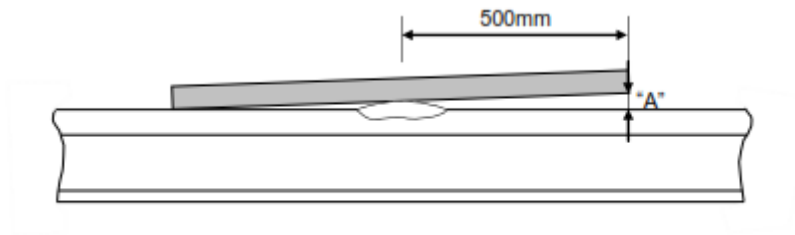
Head Repair misalignment tolerance in vertical plane (peaking)
